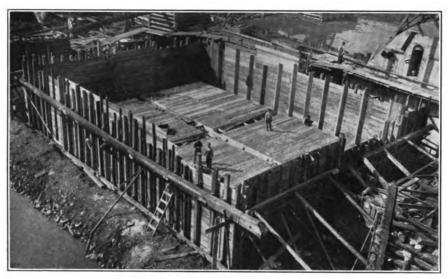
Fig. A.—Hales Bar dam showing forms for a concrete caisson.
